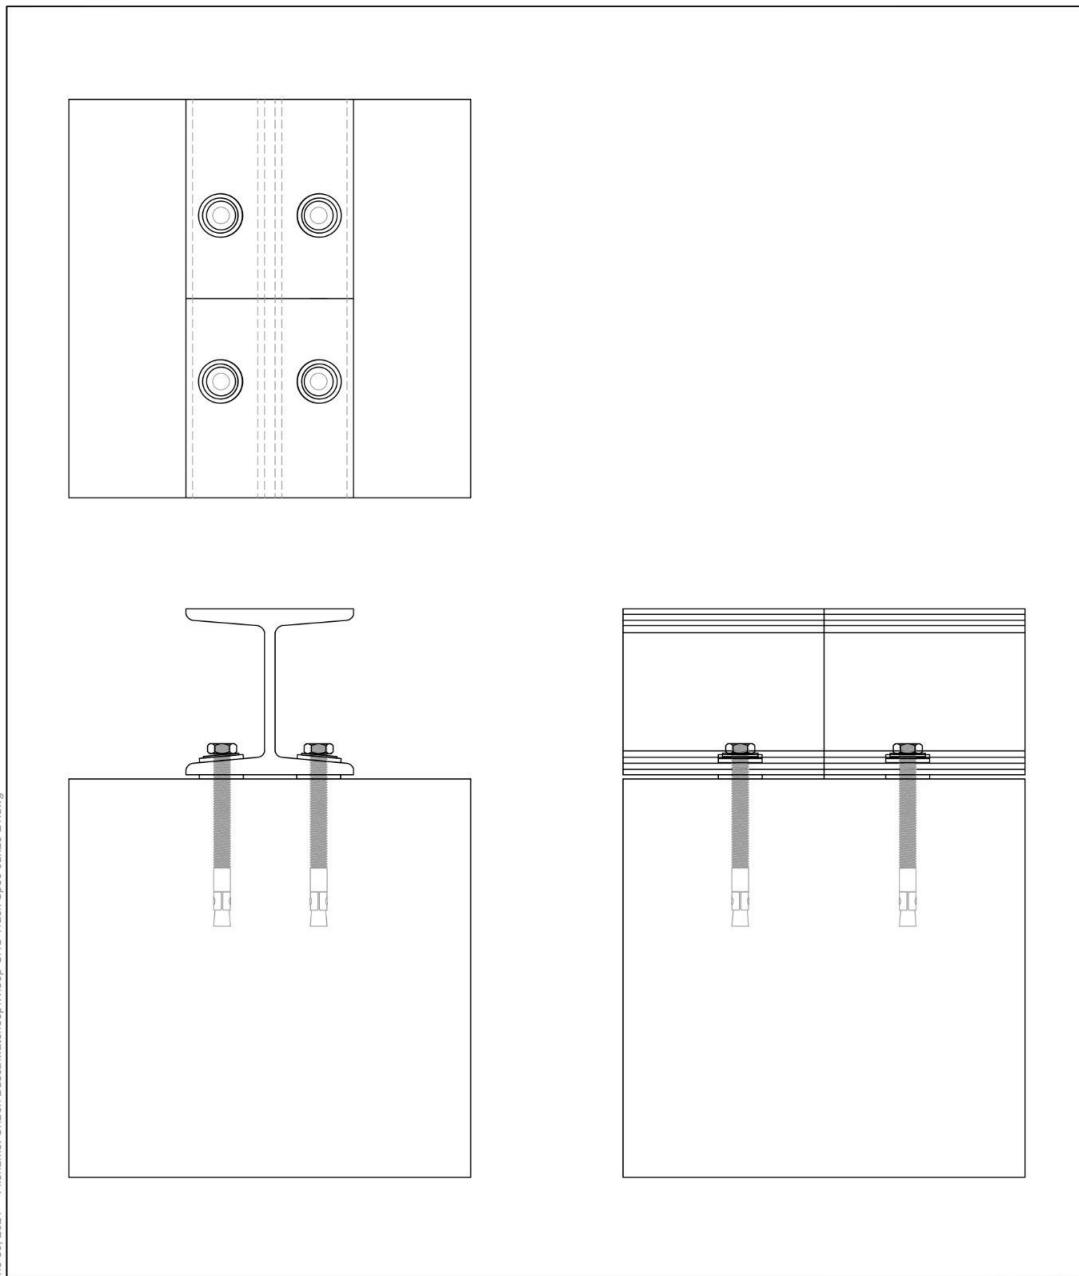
Waterloop Semi-Permanent Test Track Beam Cross Section
